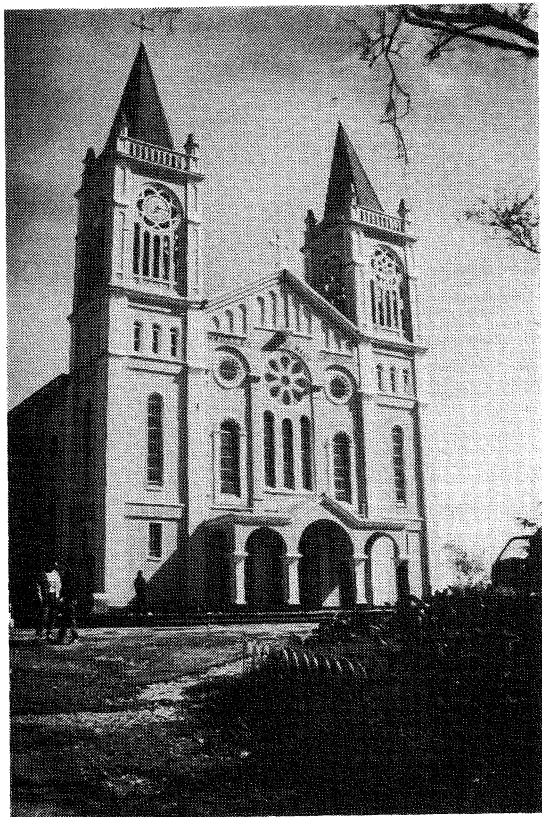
The reinforced concrete structure of Baguio Cathedral was virtually undamaged but the doors were firmly closed and services held outside. Note the tilt to the right hand tower roof
